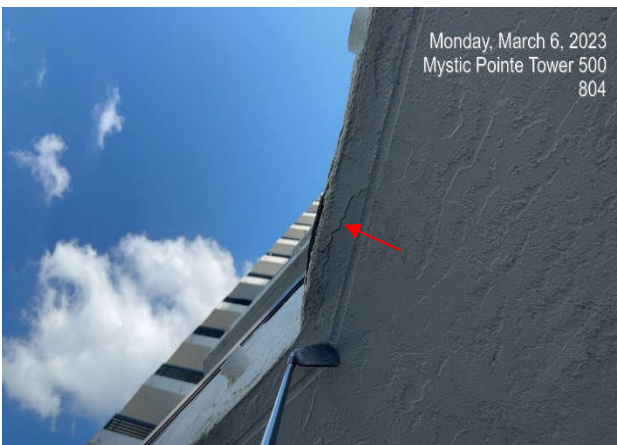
c.13 – Cracked stucco and initial stage of detachment at edge of the balcony ceiling (Unit 804)
